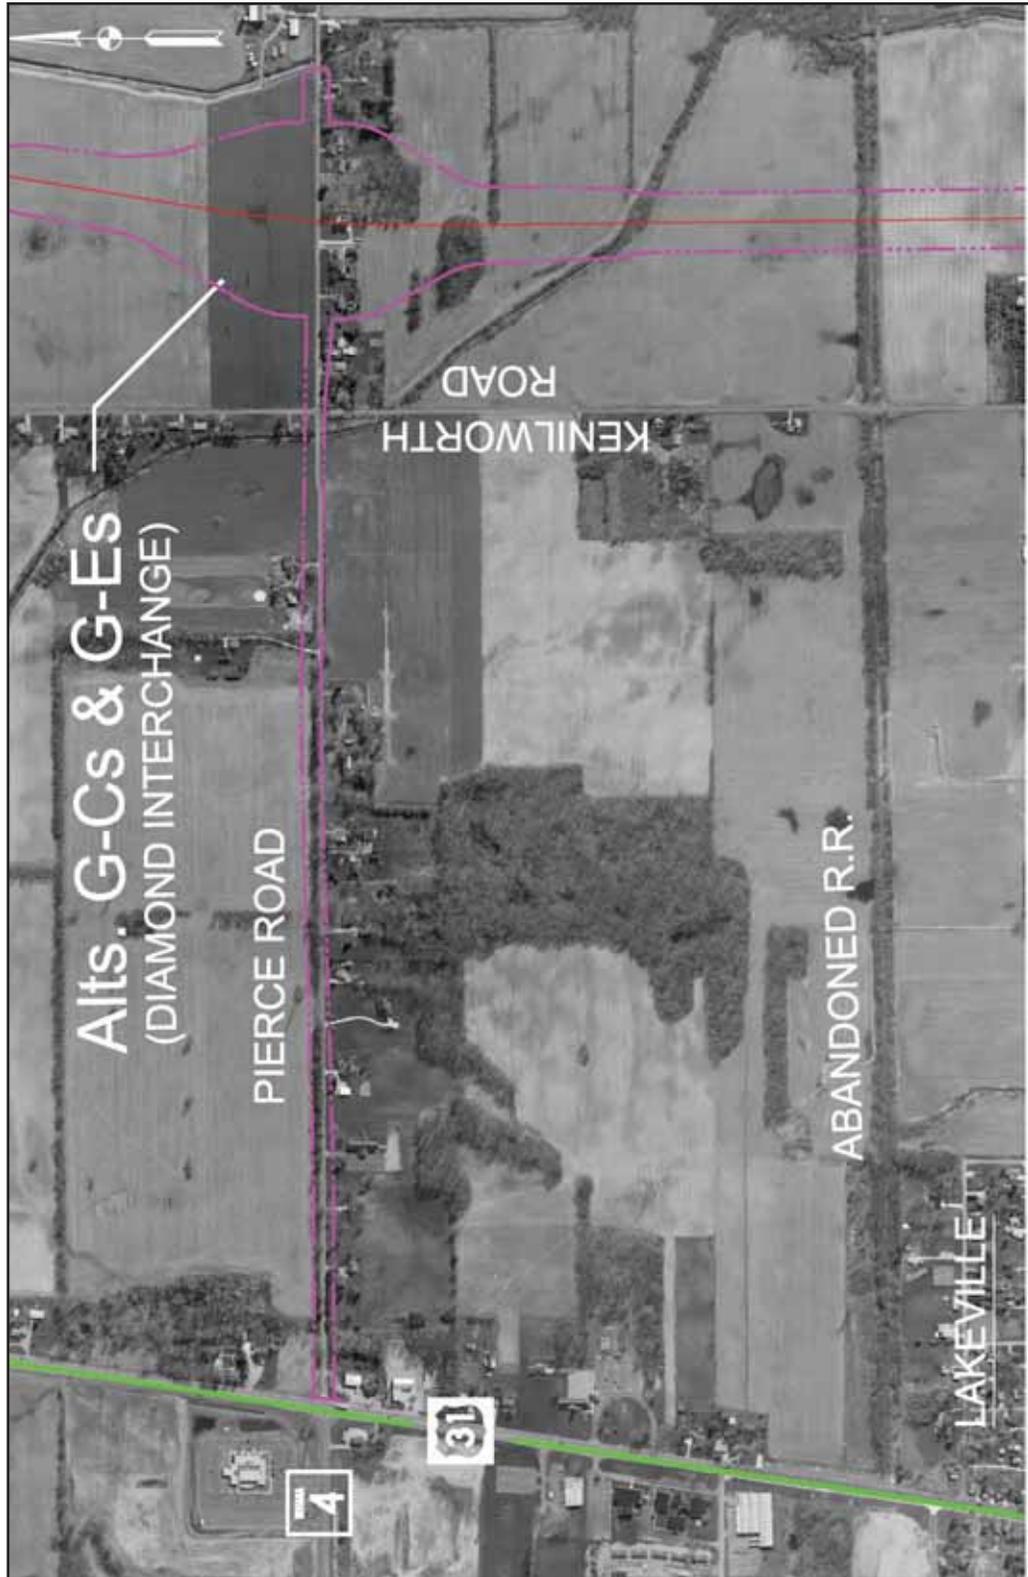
SR 4 (Pierce Road) Upgrade Local Roadway Improvement Project
